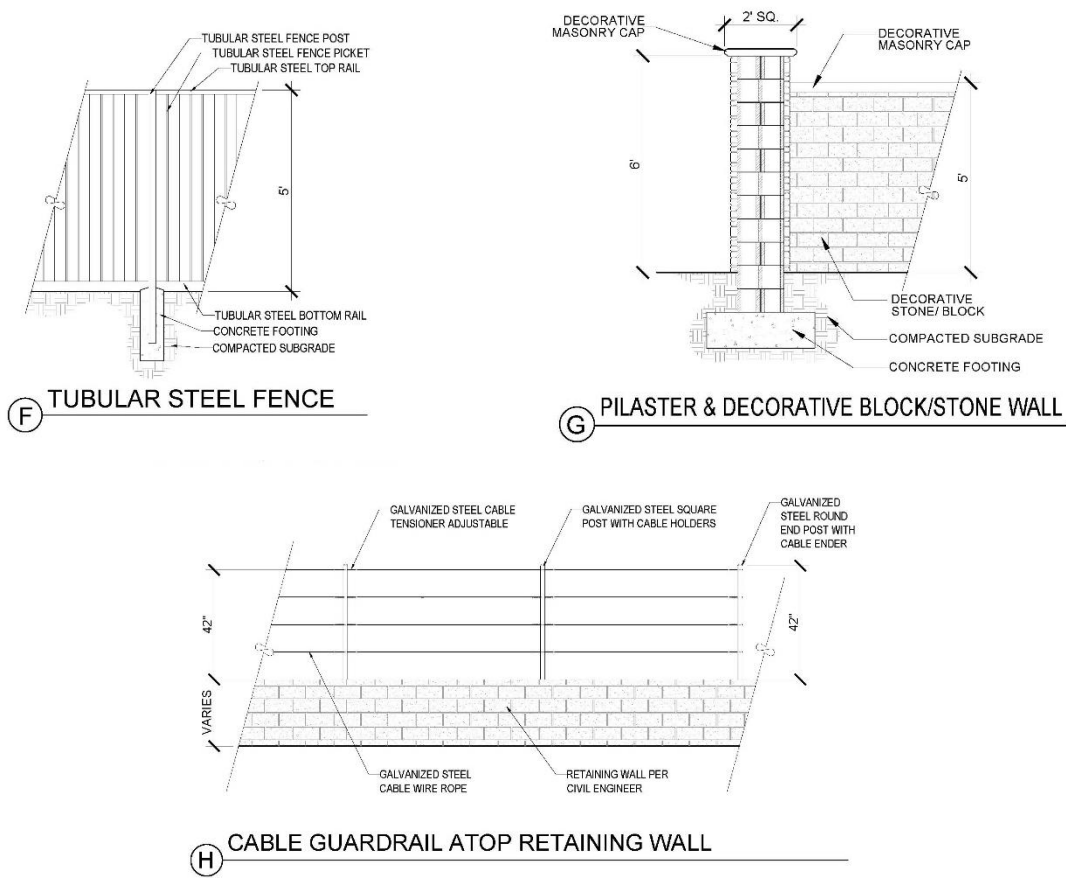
Conceptual Fence and Wall Details (continued)
